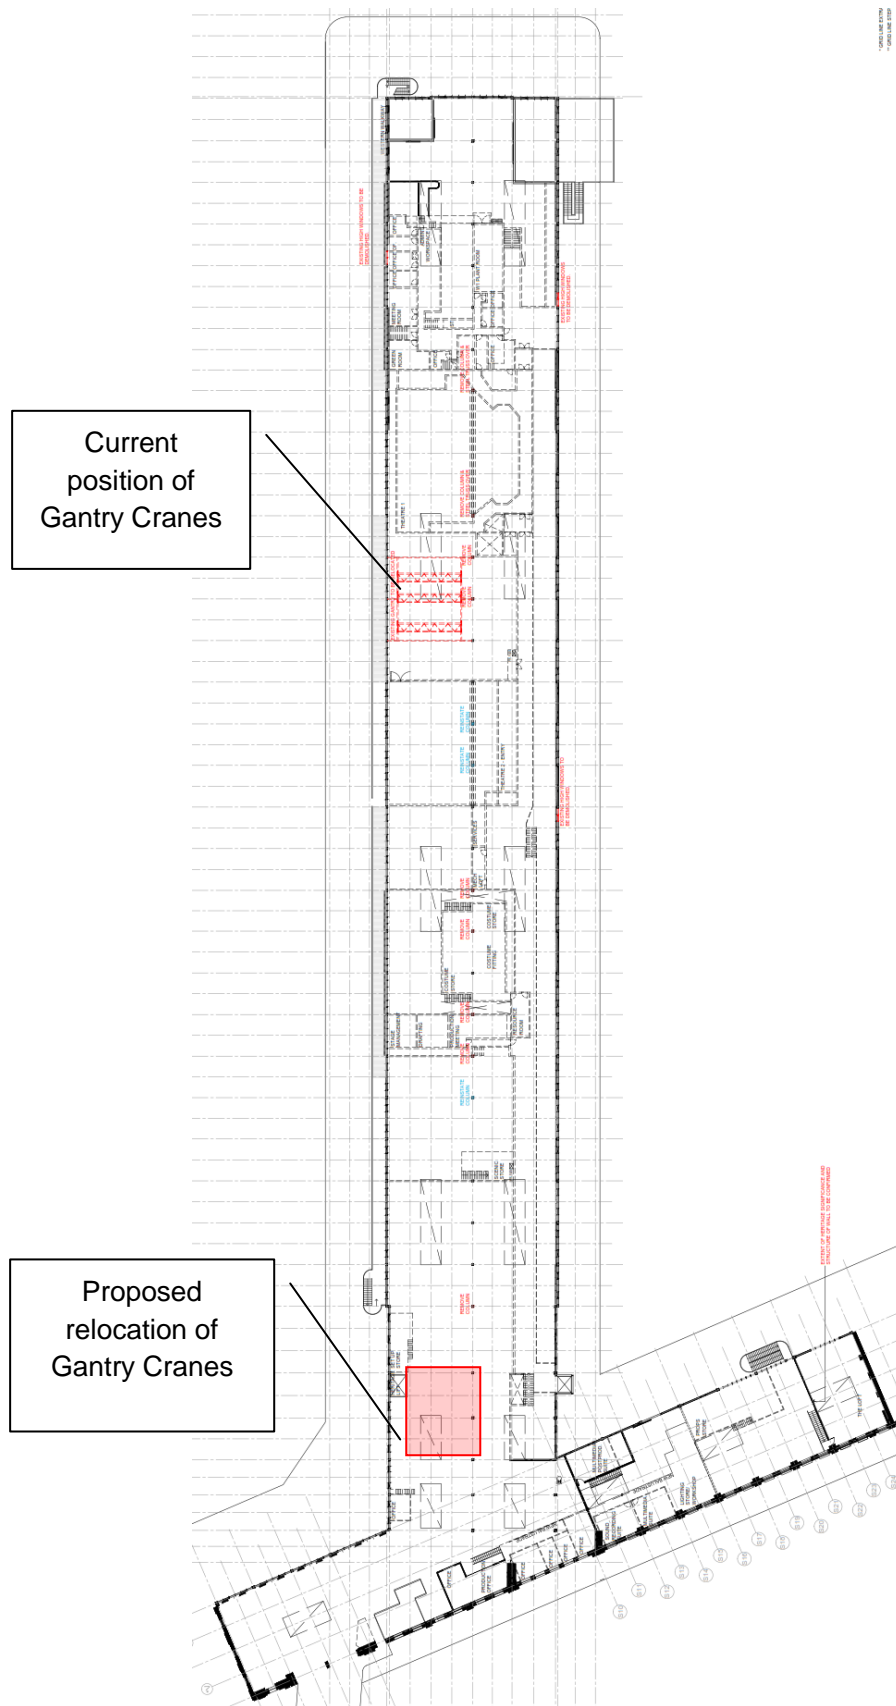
Level 1 Wharf 4/5. Plan by Hassell.
